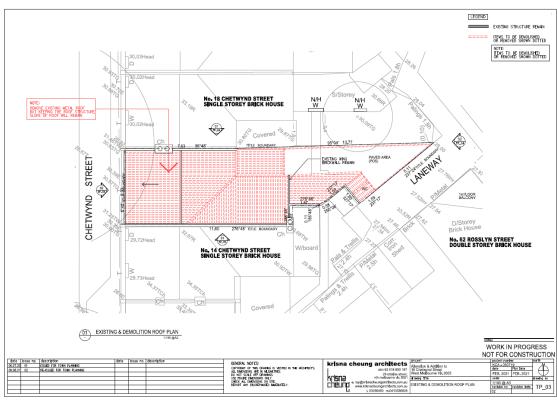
Demolition Plan (source: Krisna Cheung Architects Pty Ltd)
